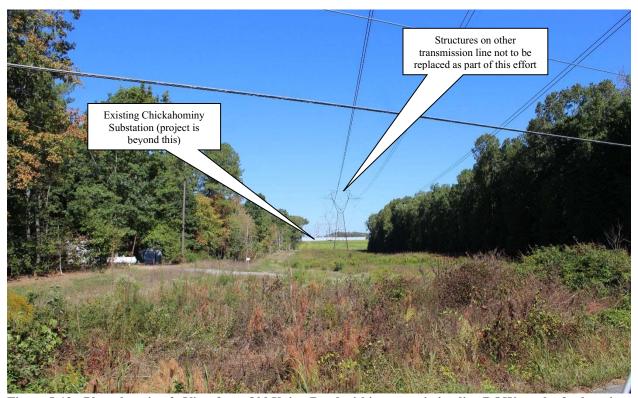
Photo location 3- View from Old Union Road within transmission line ROW south of substation, facing northeast.
